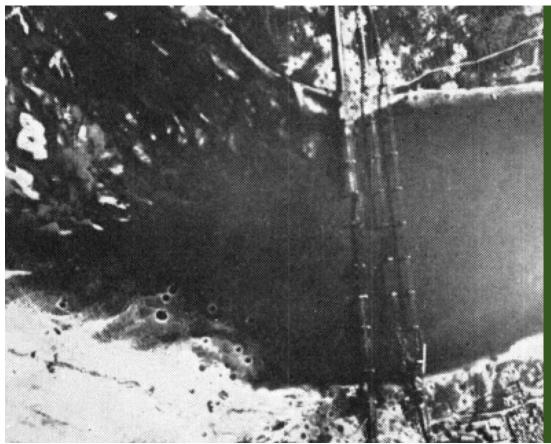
This strike photo taken five days later, on 24 August 1950, shows the progress of emergency construction efforts by KPA and railroad construction troops as they work on the double-tracked railroad bridge. The section of the pontoon bridge still remains lodged against the southern end of the single-tracked railroad bridge. (USAF)
